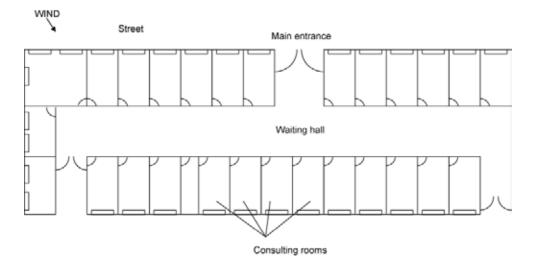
Floor plan showing the waiting hall and consulting rooms
